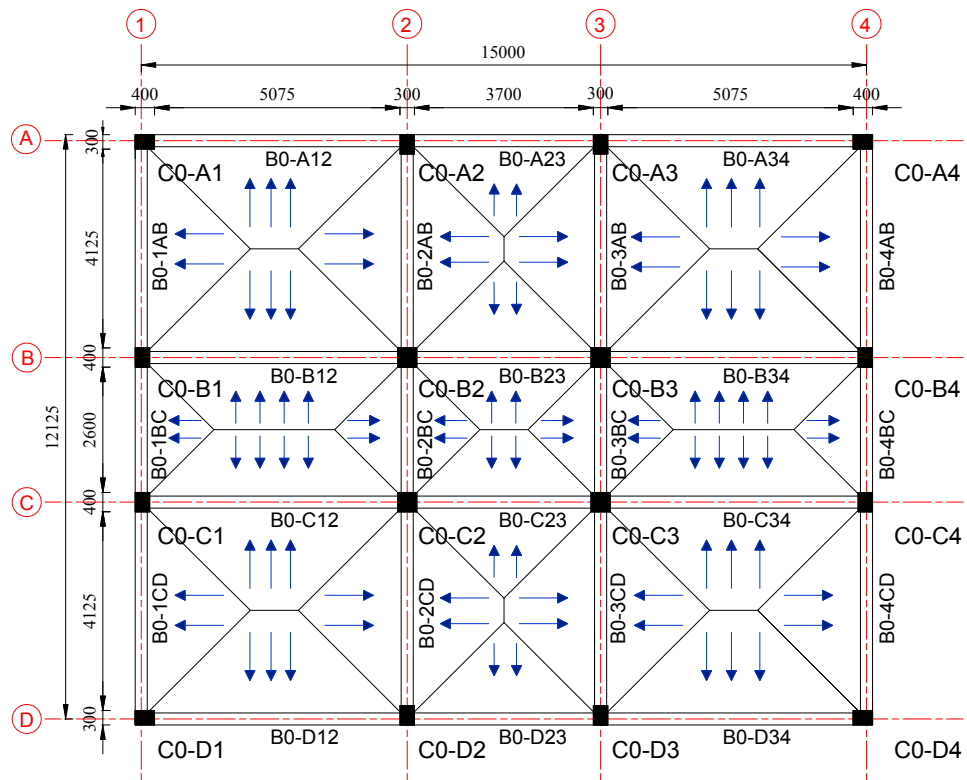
Load transfer from slabs to the beams at ground floor.
